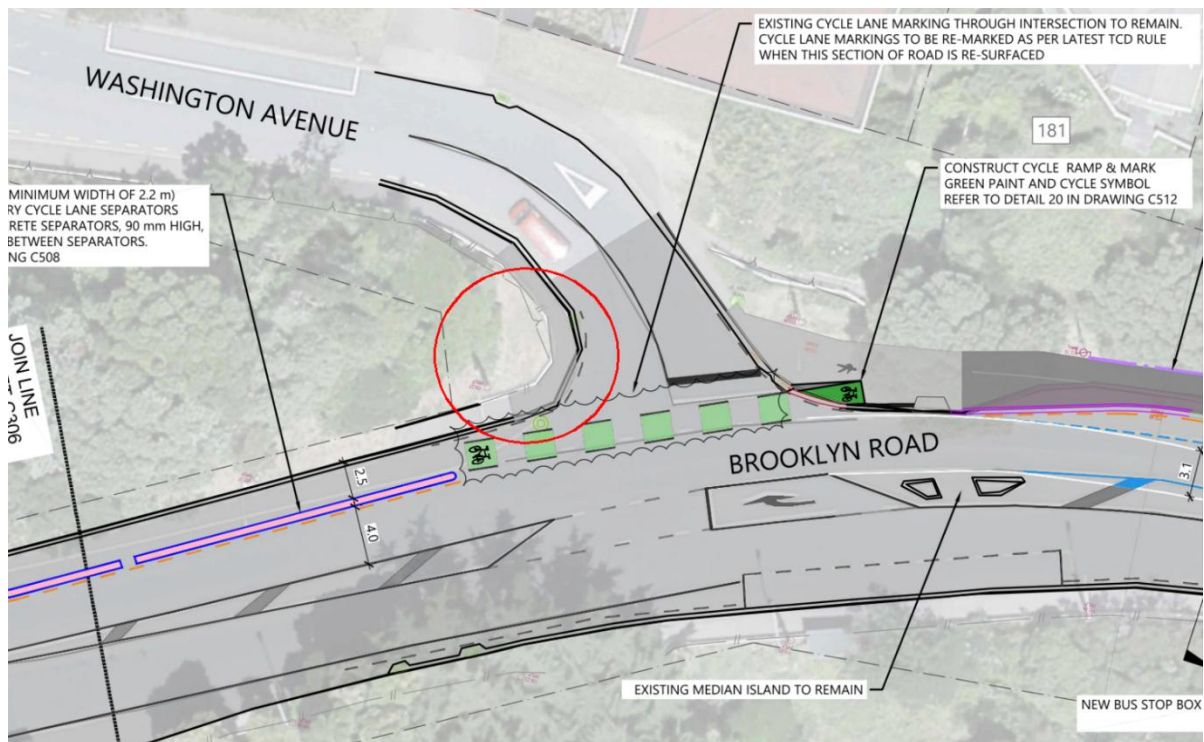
Drawing Sheet C307 - Pedestrian Facilities at Brooklyn Road & Washington Avenue Intersection
